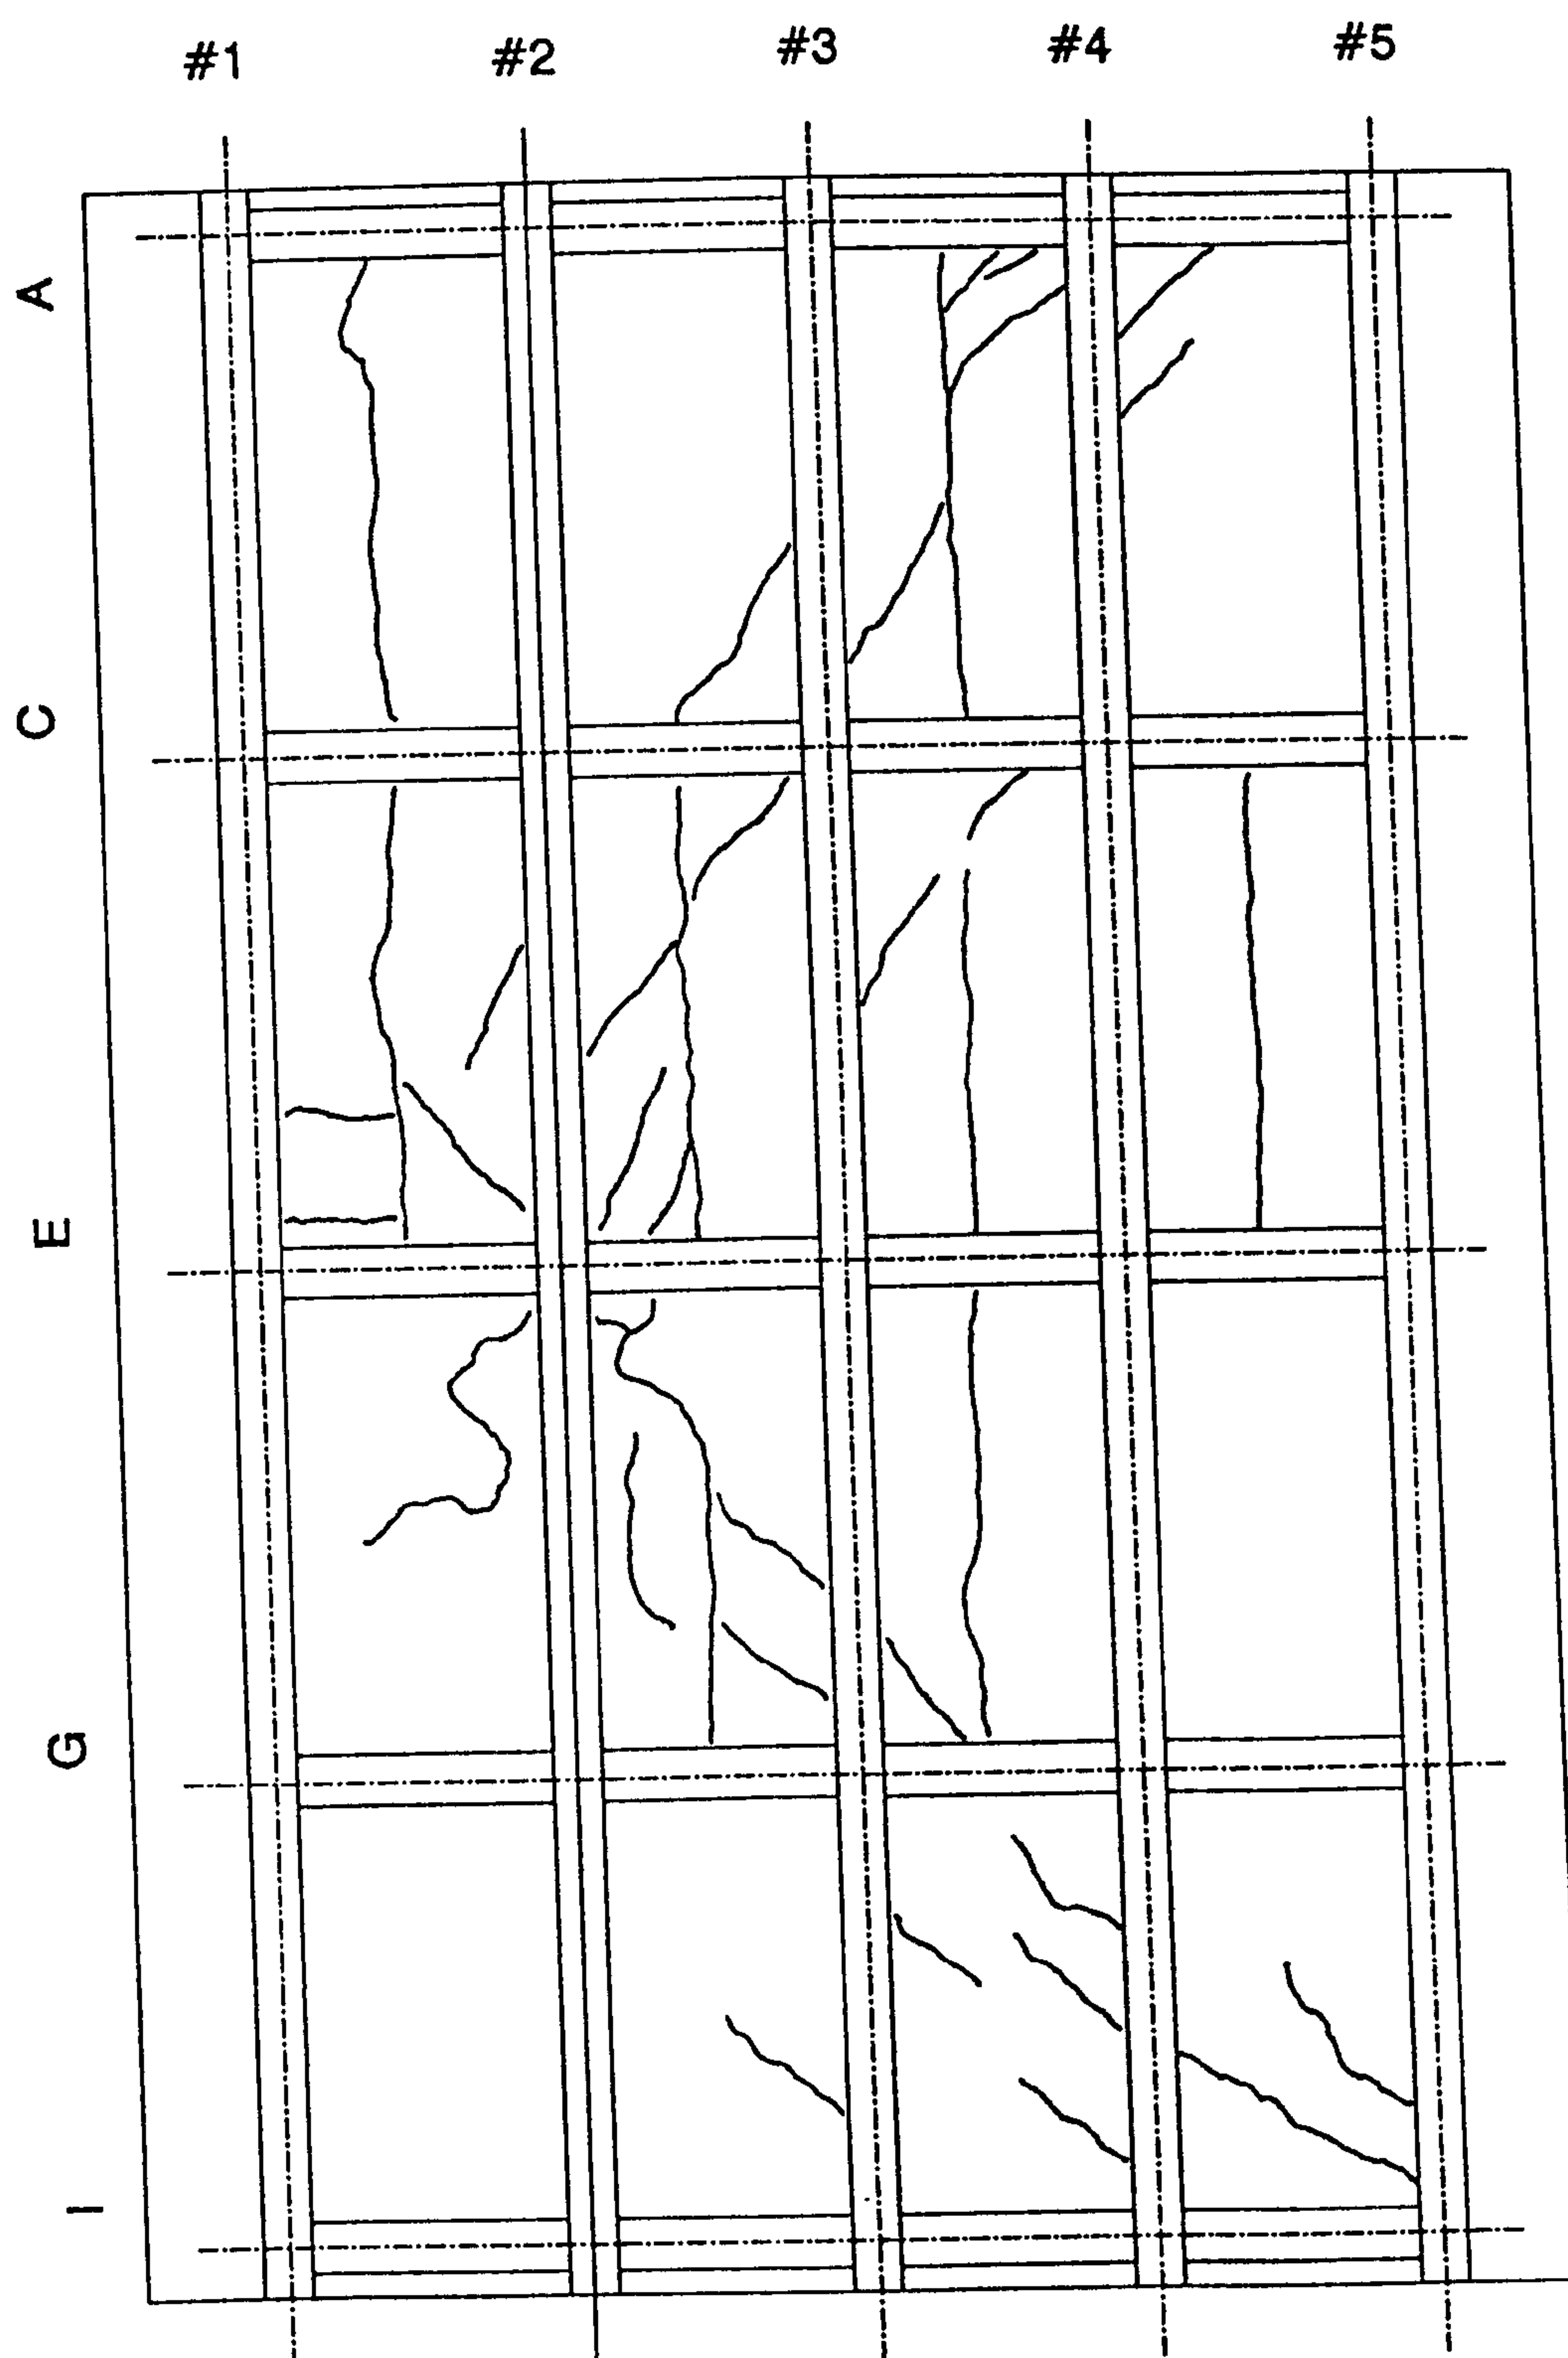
Underside View of Crack Pattern of Model Bridge Deck after Testing
